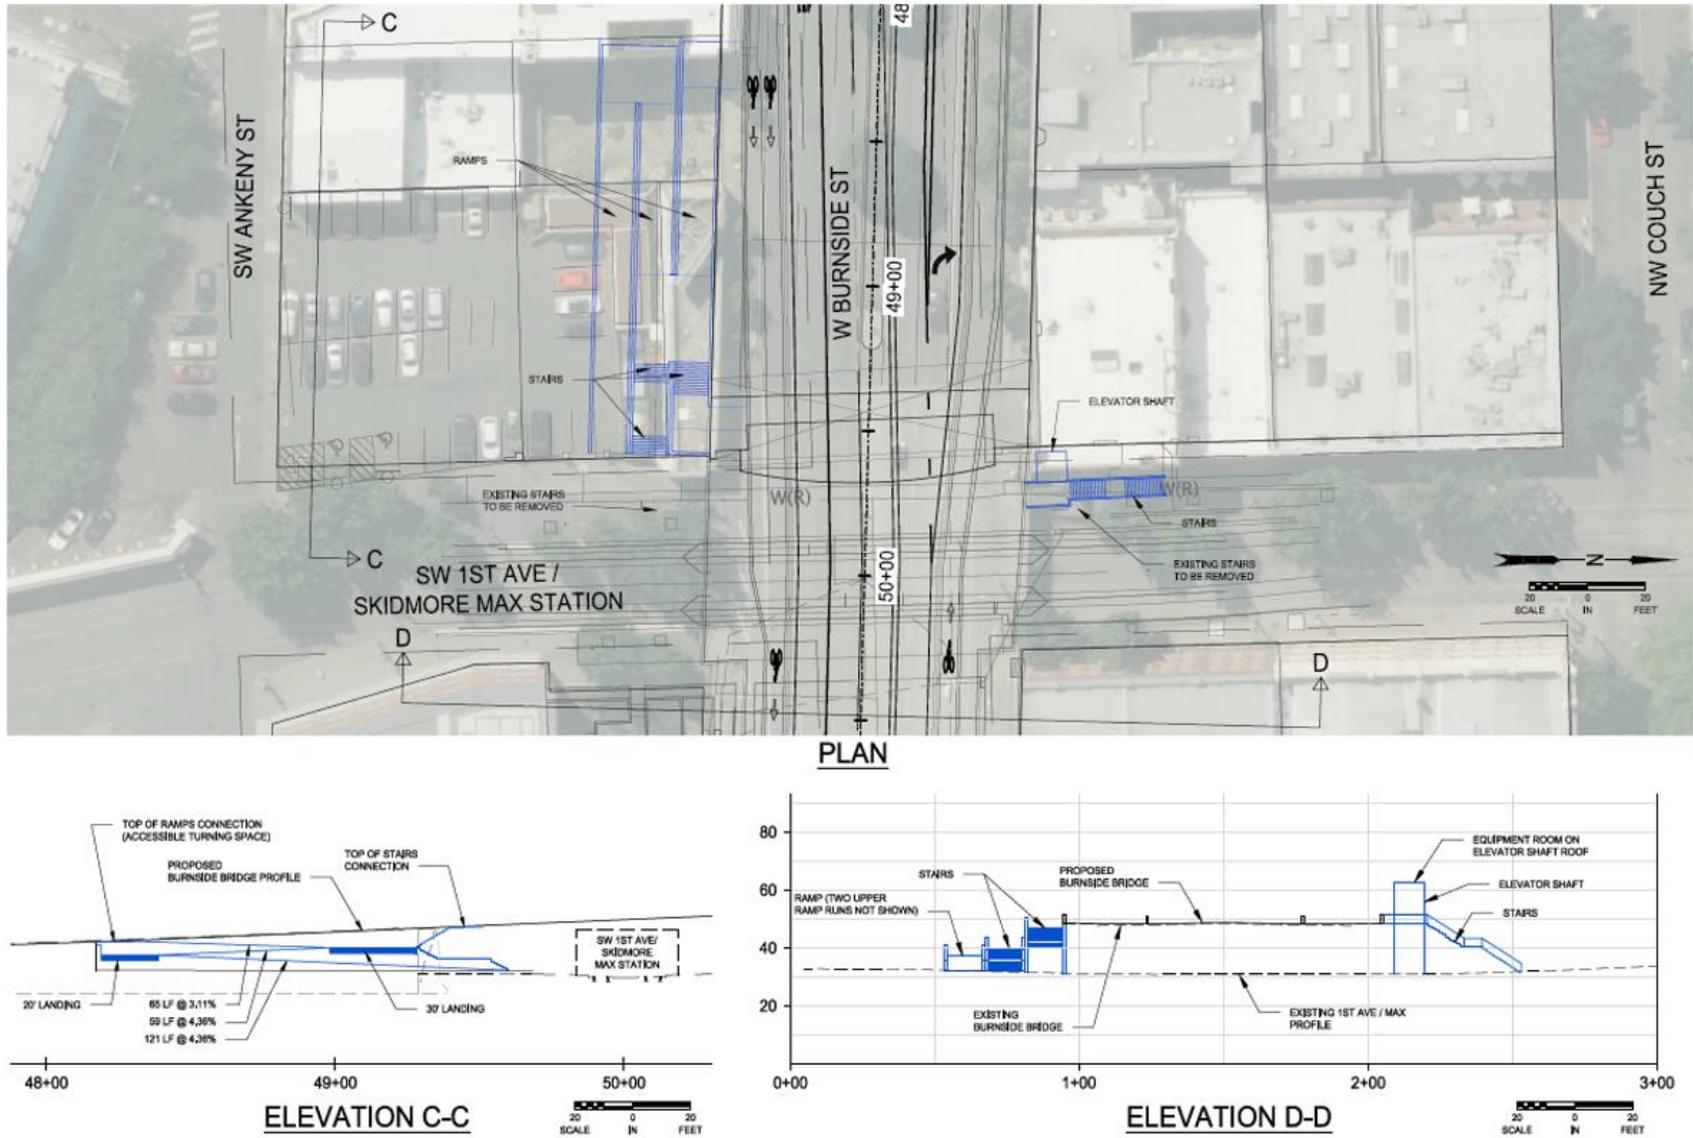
Sidewalk Improvement Routes from North Sidewalk (Point A) to Skidmore Foundation MAX Station (Point B)
